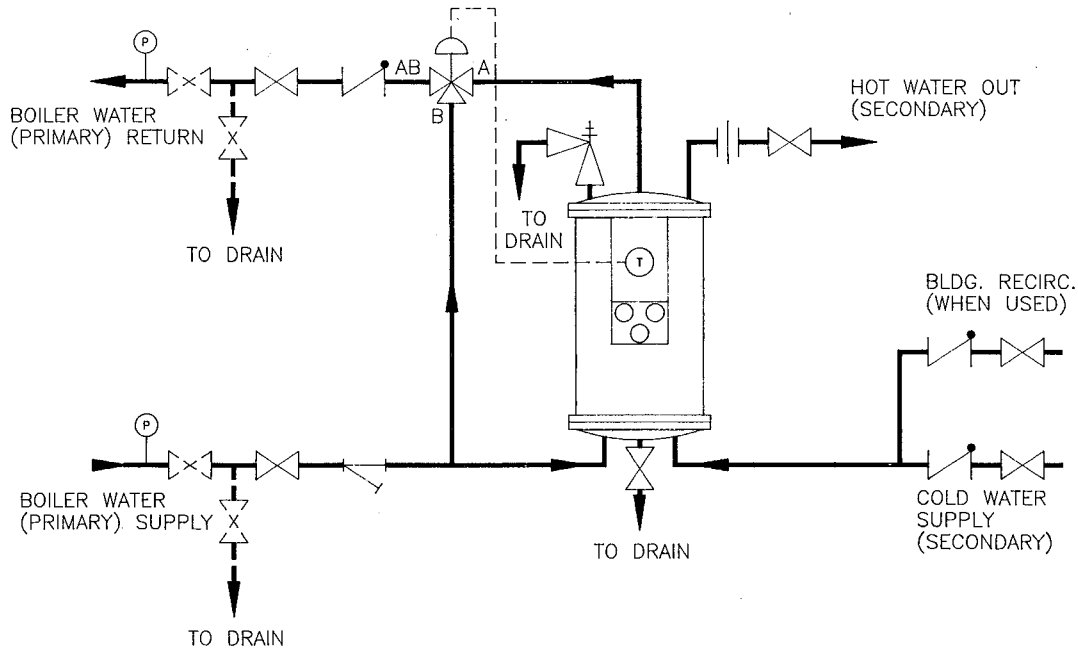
Single Water To Water Heater With 3-Way Mixing Control Valve at Primary Fluid Outlet From Heater
